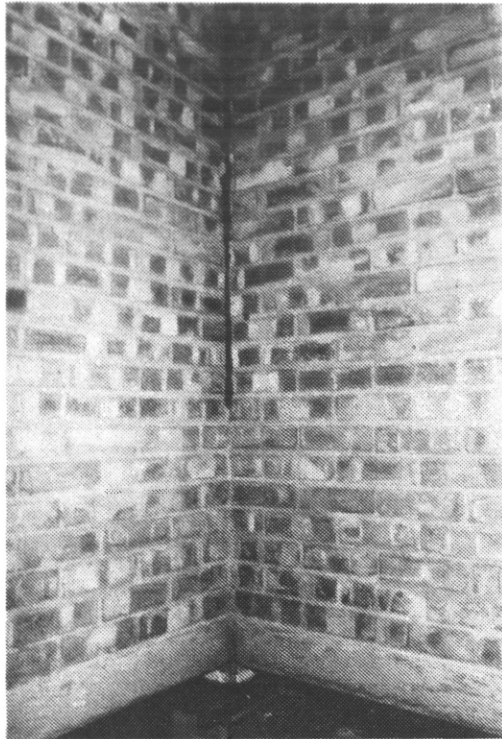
Vertical edge crack at the intersection of main and adjacent walls (Test W4).
